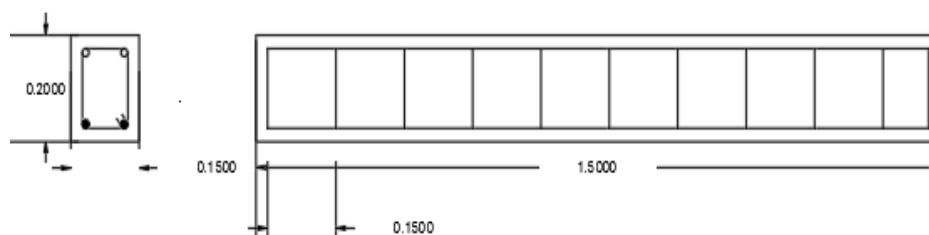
Sectional View of concrete beam (all dimensions are in meter).
